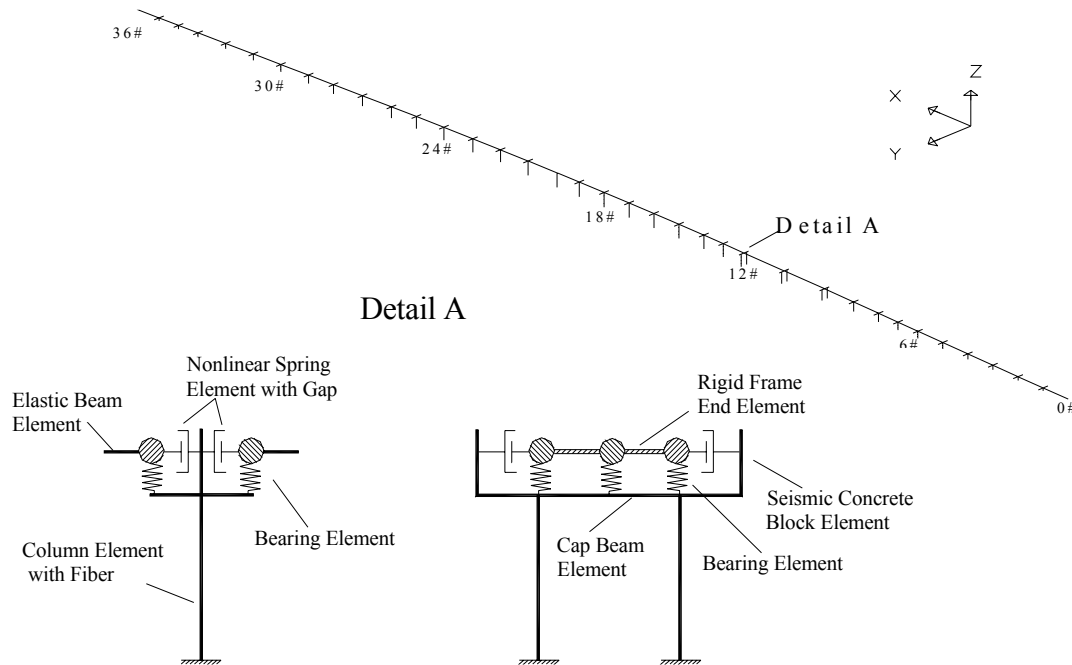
Nonlinear local model of simple girder bridge in 3-1 line
